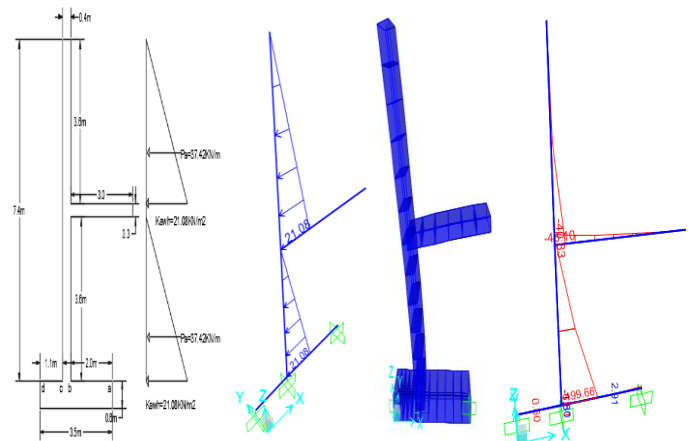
Deflection and BMD diagram of 8m high retaining wall with single shelf.
